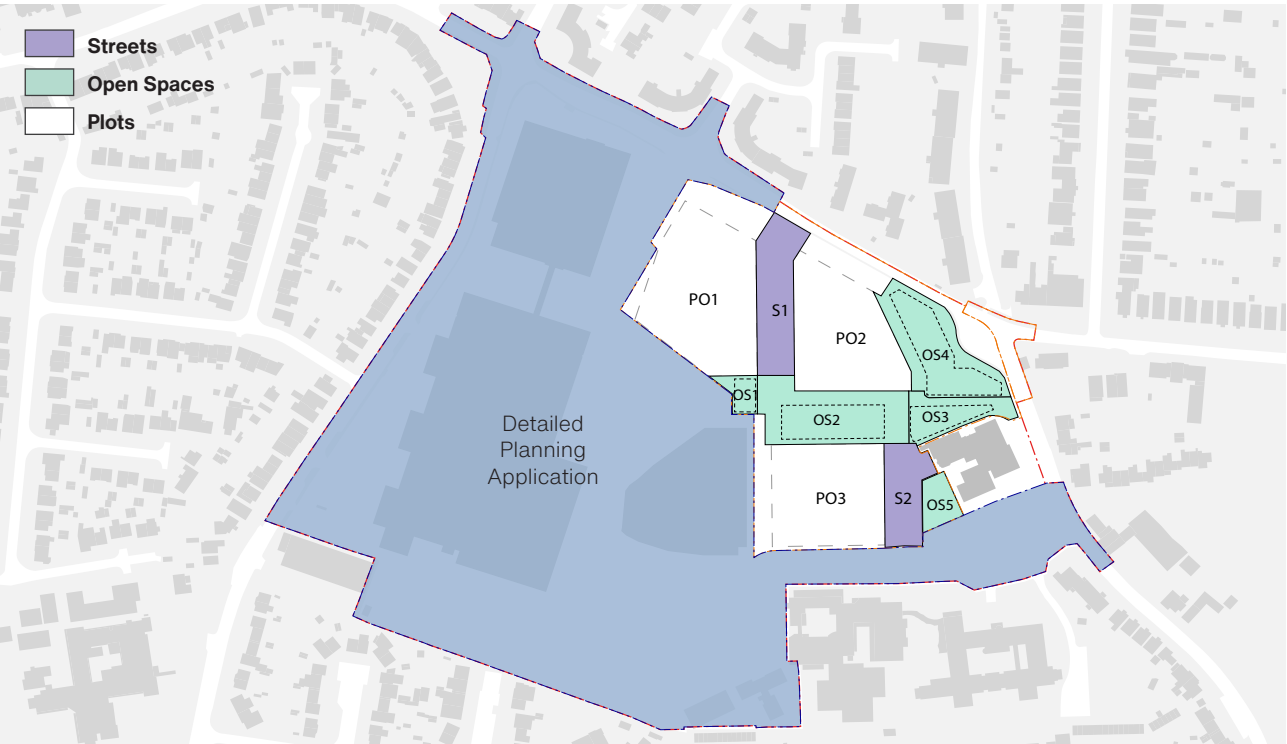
Masterplan Layout - Outline Planning Application Boundary
